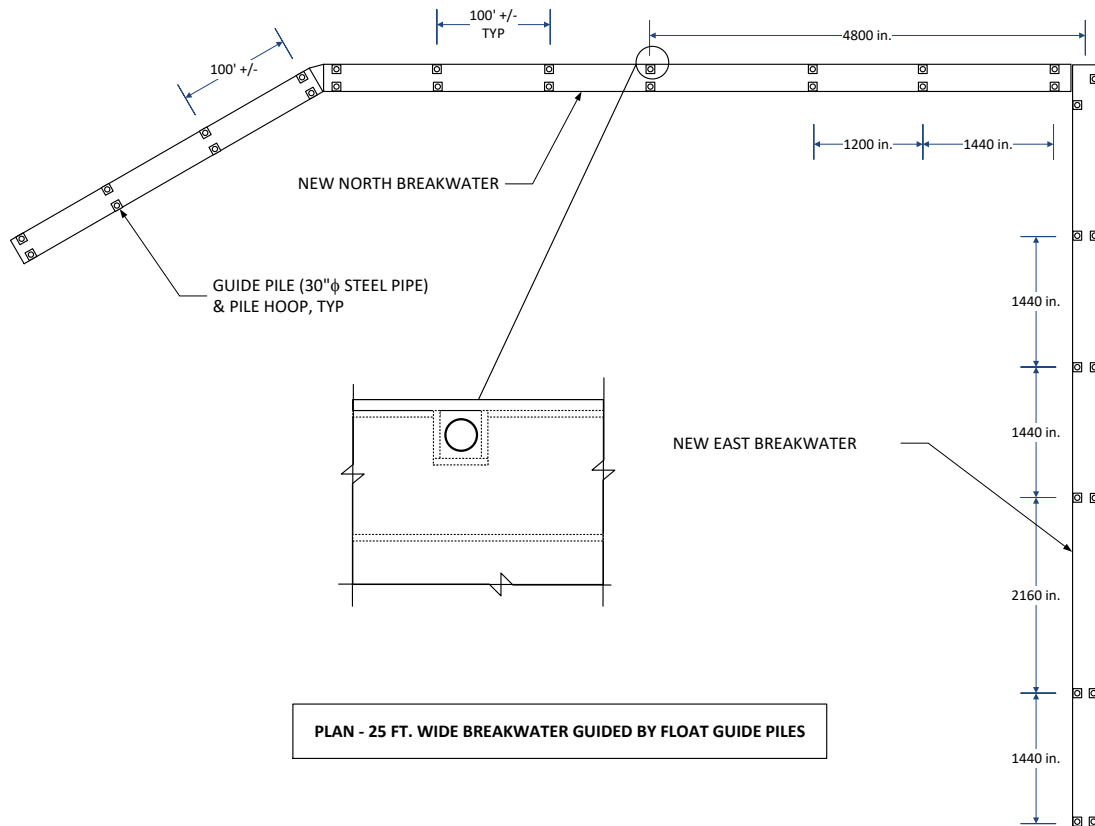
Typical Interstitial Guide Pile Mooring System Installation Plan for 25 and 20' Wide Floats (34 Piles)
